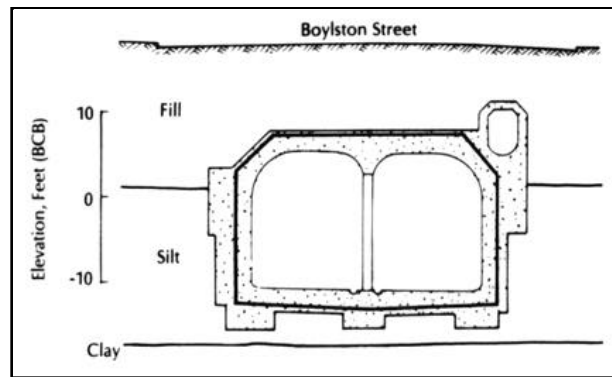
A cross section of the Boylston Street Subway at Sta. 58+00 between Berkeley and Clarendon Streets. (Ref. 21).
